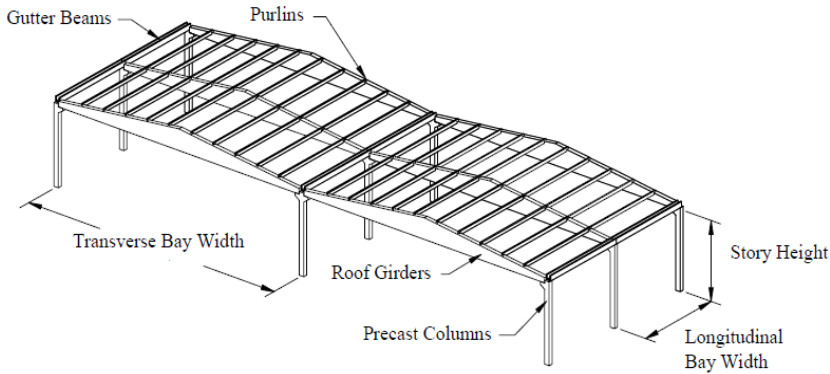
Geometrical configuration of a typical European one-story precast industrial building (Posada and Wood, 2002)
